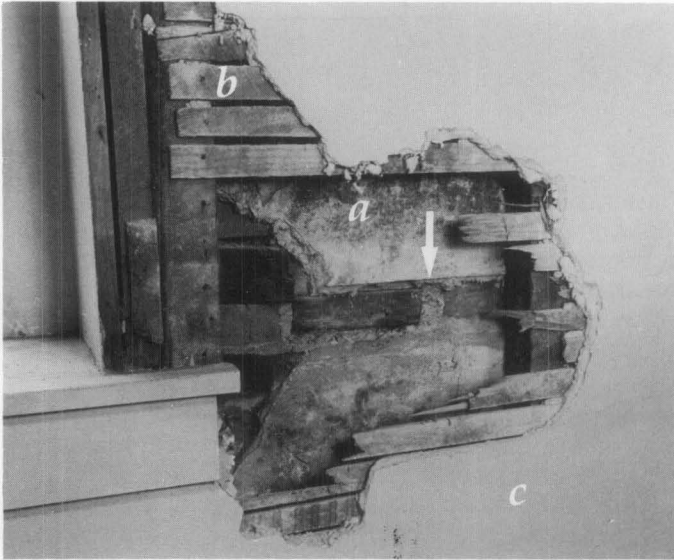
A hole in the wall of a 1760s Custom House in Chestertown, Maryland illustrates the evolution of the room. (a) The original plaster was applied directly to an exterior masonry wall and the chairrail (missing here, see arrow) was in place before the wet plaster was applied to the wall. Sometime later when the interior was modified, the masonry was furred out. Machine-sawn wood lath (b) was nailed to the furring strips and (c) new three-coat plaster was applied. Photo: Maryland Historical Trust.
